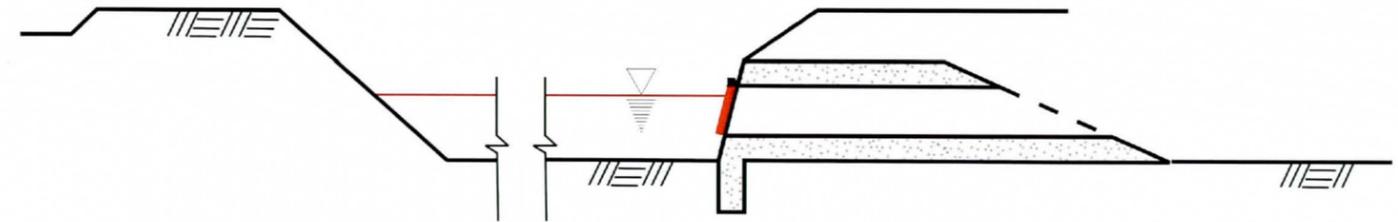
Flows in the EMF below the sideweir crest level continue on downstream.
